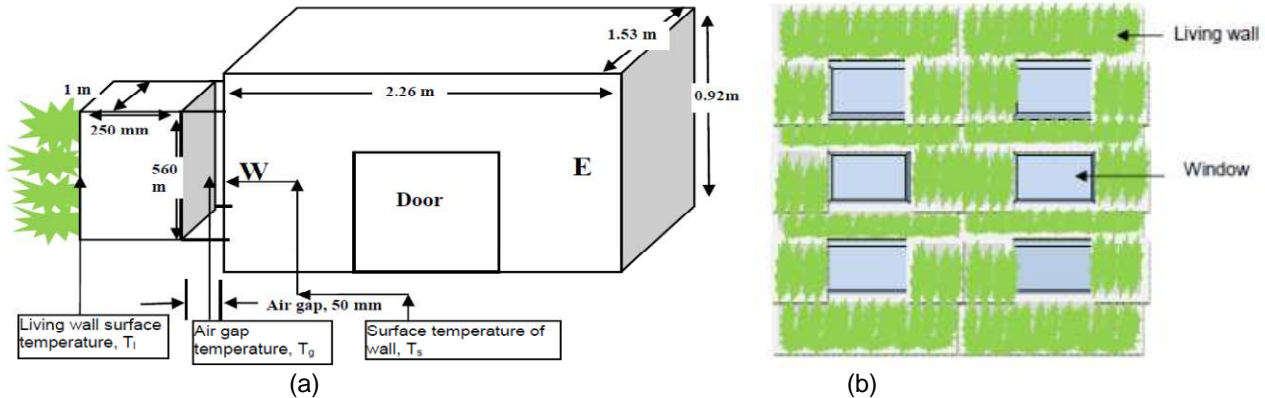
(a) Schematic diagram of experimental setup of Living wall system in west facing wall at the UQ, Gatton
